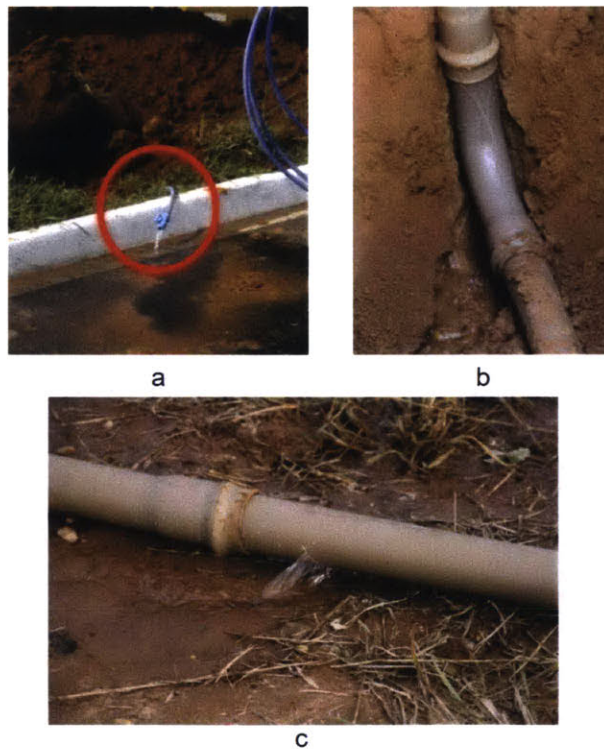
Leaks in 50mm pipe. a) house connection, b) improperly installed o-ring seal on vertical bend, c) linear cracks in pipe
